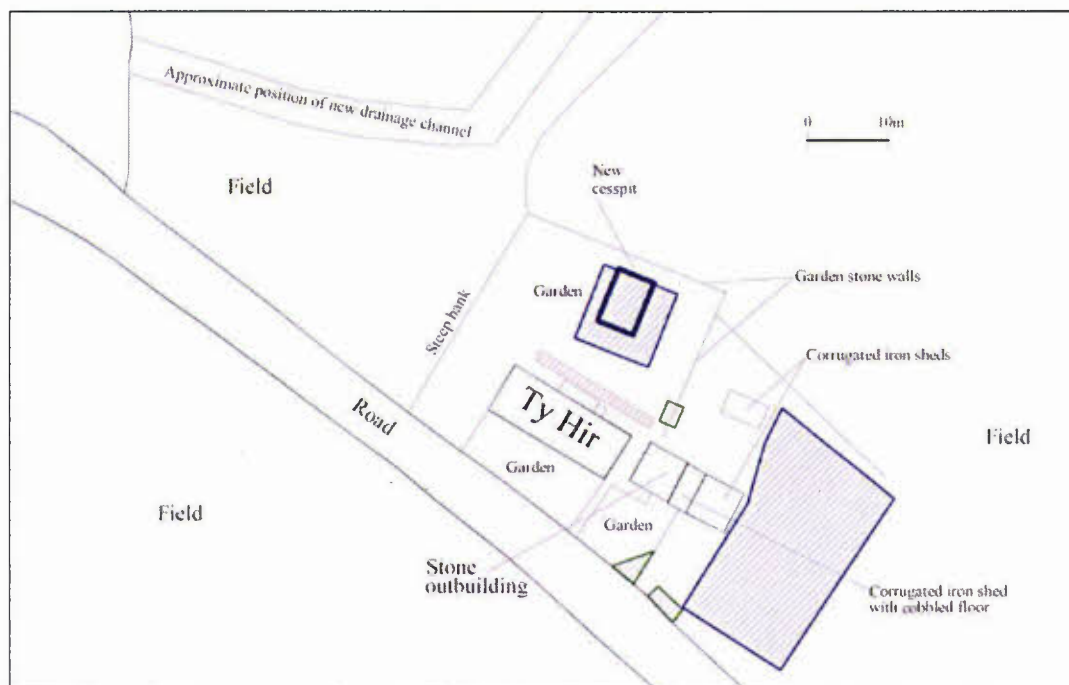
Plan of Ty Hir and the groundworks carried out at Ty Hir, Cilcennin (blue shows areas of topsoil stripping; red shows concrete patio removal; green shows where stone walls were cut through to improve access)
